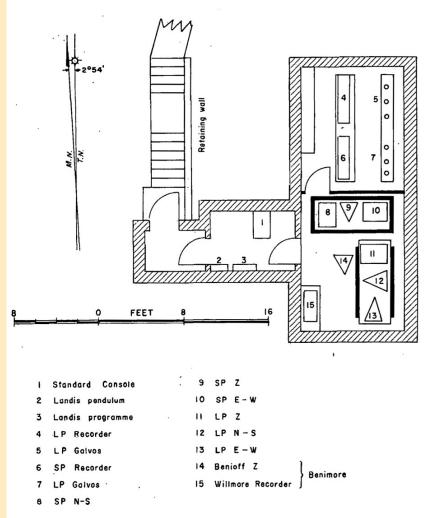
shows the floor plan of the vault, which is built into an excavation on the side of a ridge. The excavation penetrates into solid granite. The walls and arched roof consist of an inner shell of concrete, a waterproof membrane, and an outer covering of brick to a total thickness of 11 inches (280mm). The vault floor floats on a layer of rubble through which agricultural drains are laid, discharging onto the surface below the excavation. The excavation is filled with gravel and the roof is covered with three feet of gravel. Concrete seismometer piers are isolated from the floor and bedded into the granite. Recorder and galvanometer piers rest on the floor and are built of brick with concrete slab tops. A plywood partition and door were placed between the seismometer and recording sections in June. The annexe, consisting of a porch and console room, provides a light and thermal barrier to the vault proper. Note: Item 7 should be SP Galvos.
